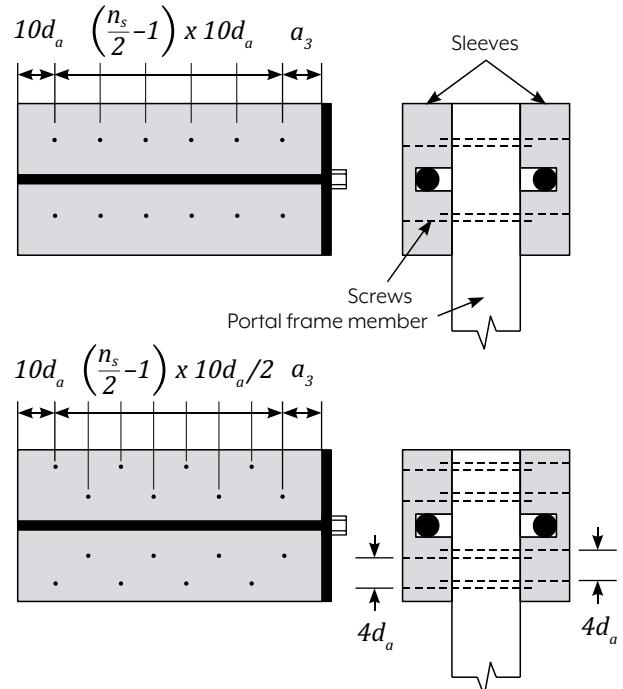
Screw Spacing Requirements for Quick-Connect Moment Connection, side view
